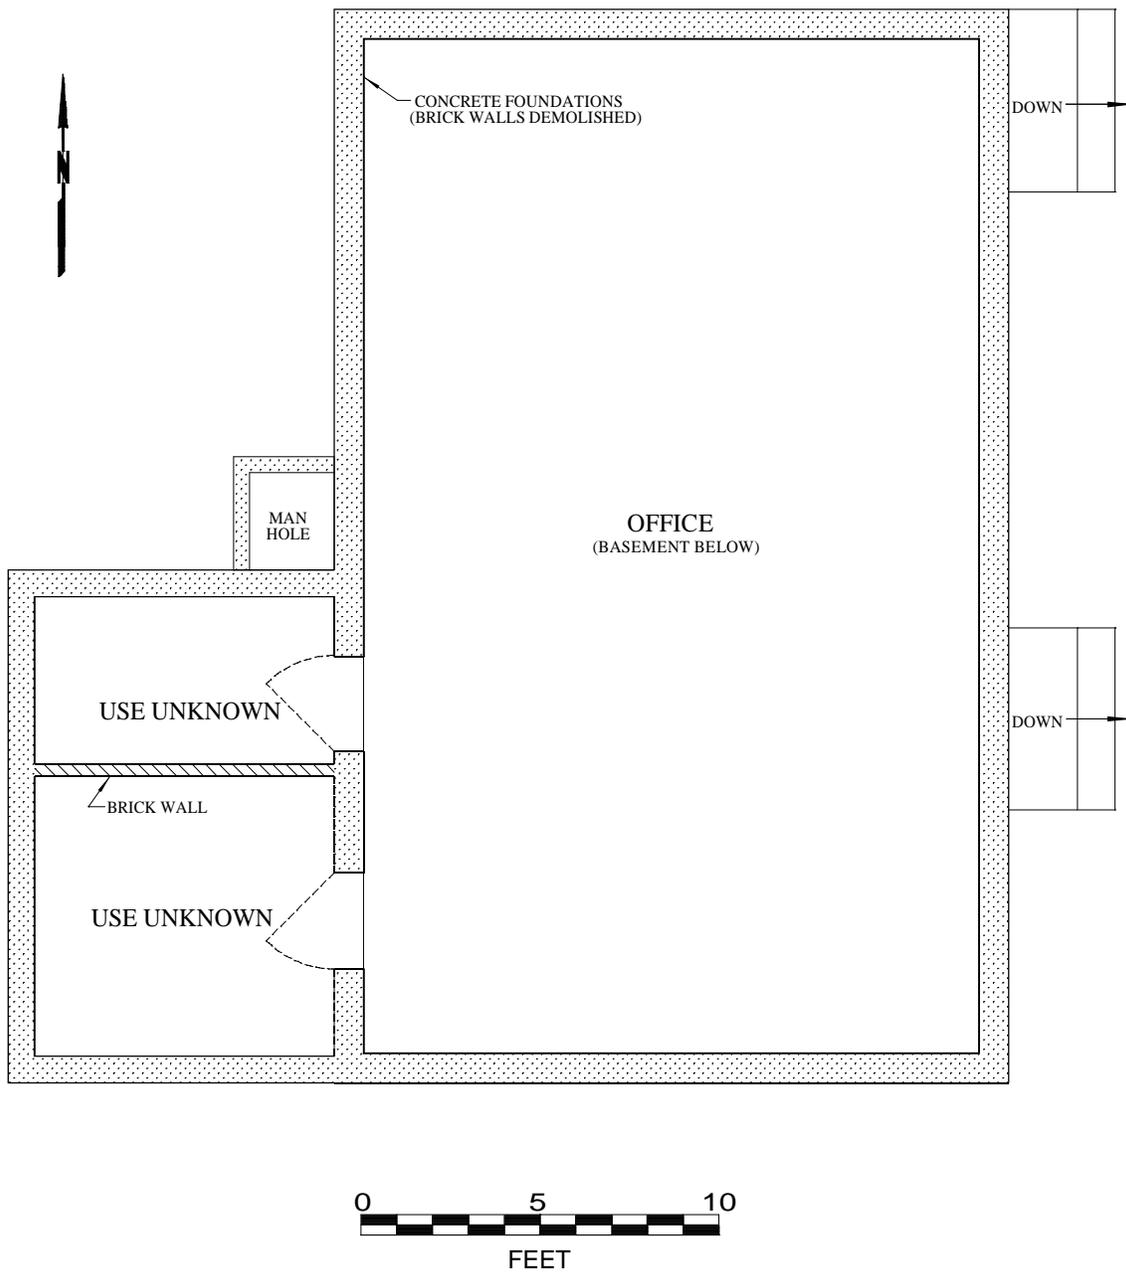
Plan view of the office building (Feature 5) at the mine site, showing existing conditions (FRR 2002).
